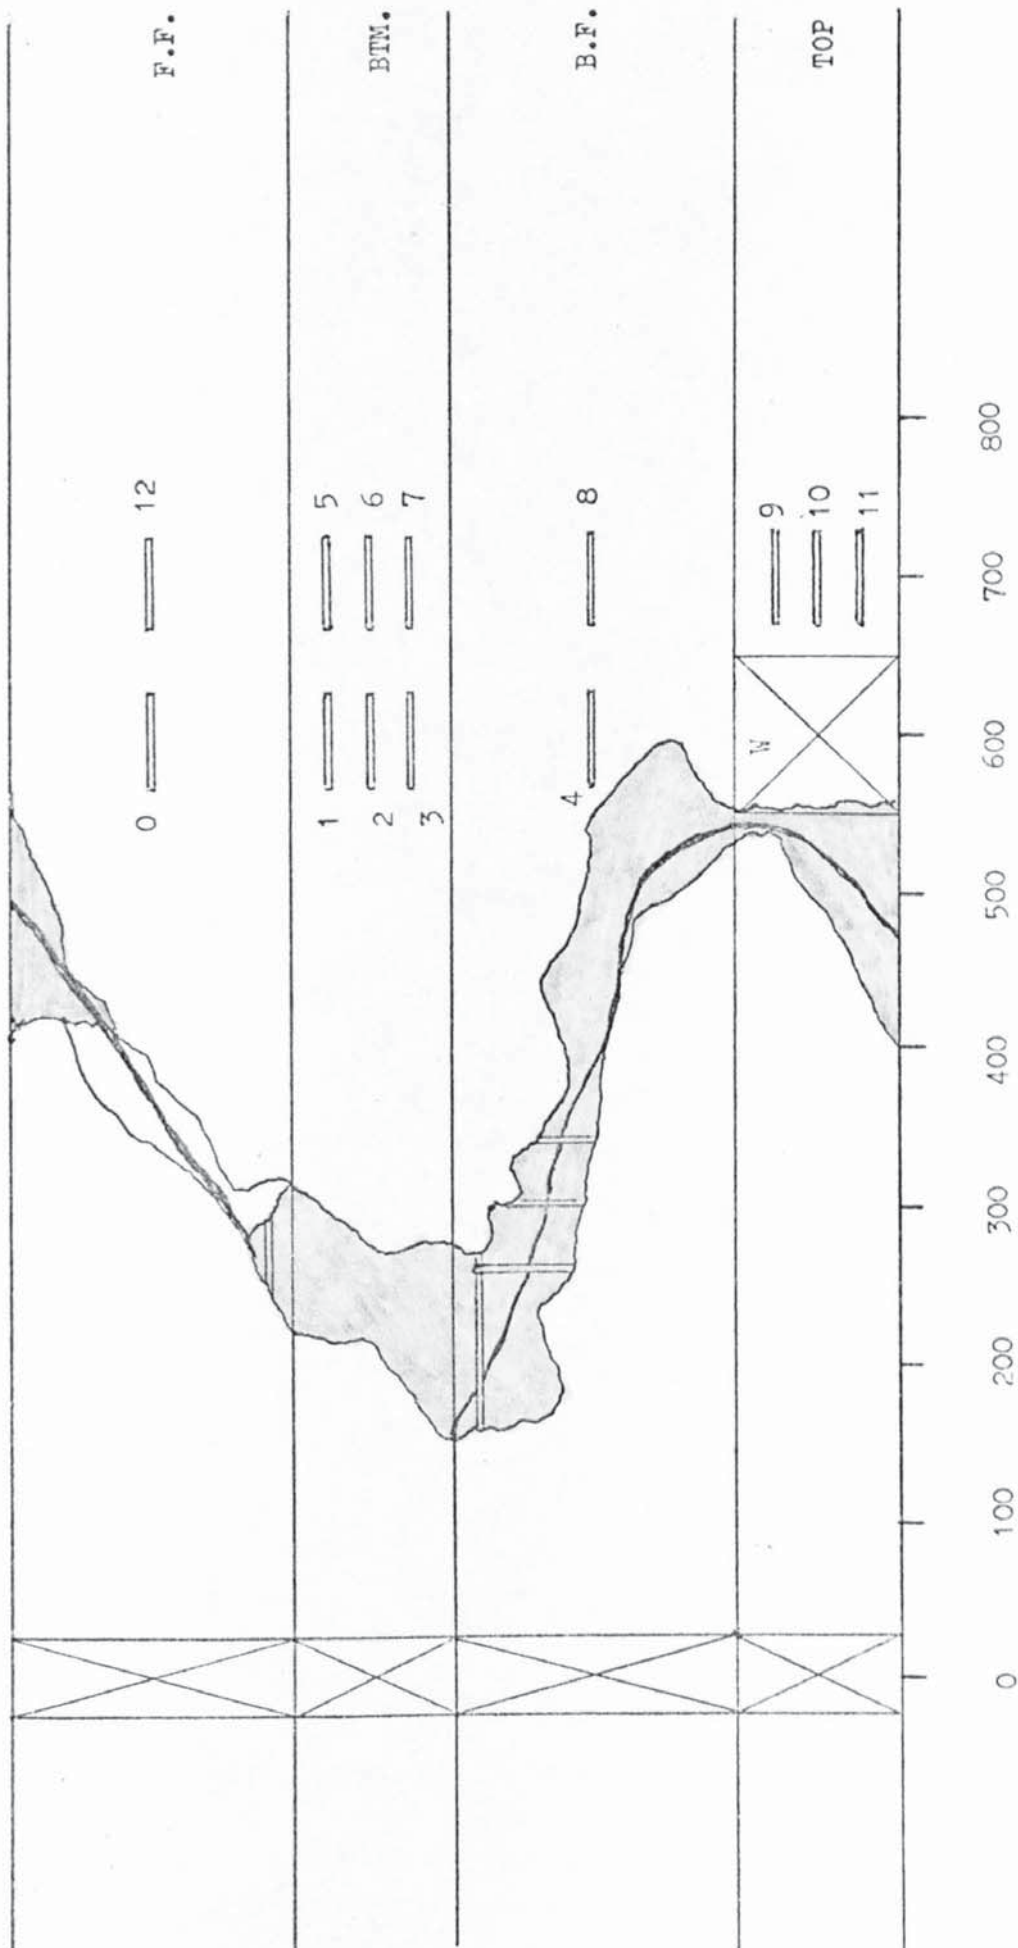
FAILURE CRACK PATTERNS - BEAM 41 ( MODE 2 )
